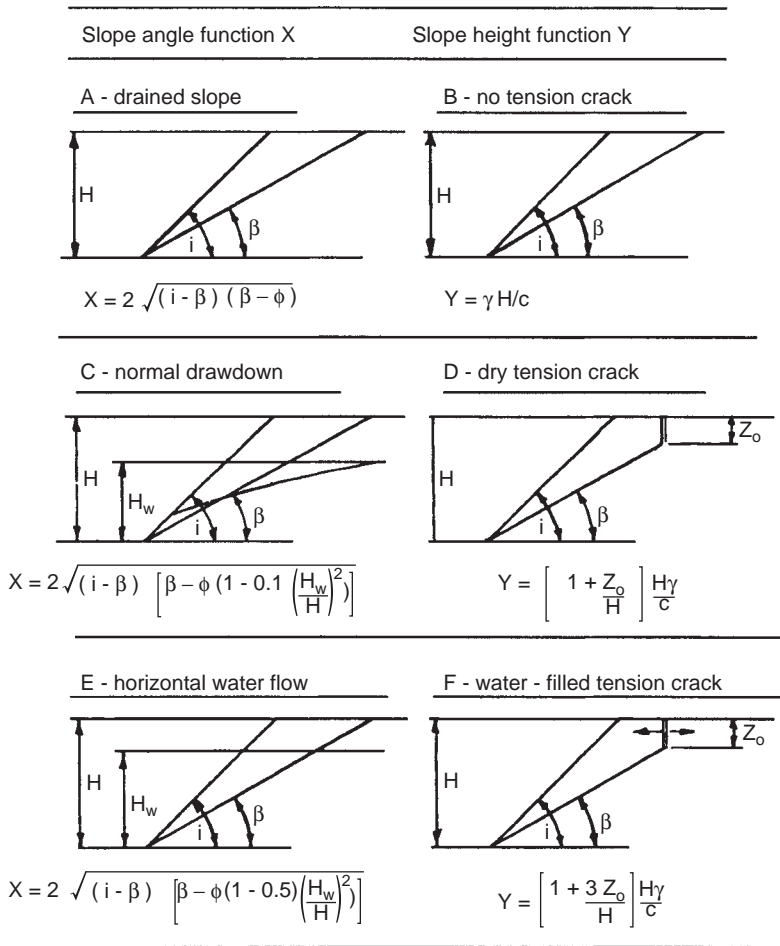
Slope angle and slope height functions for different water and tension crack conditions (Hoek, 1970a).
